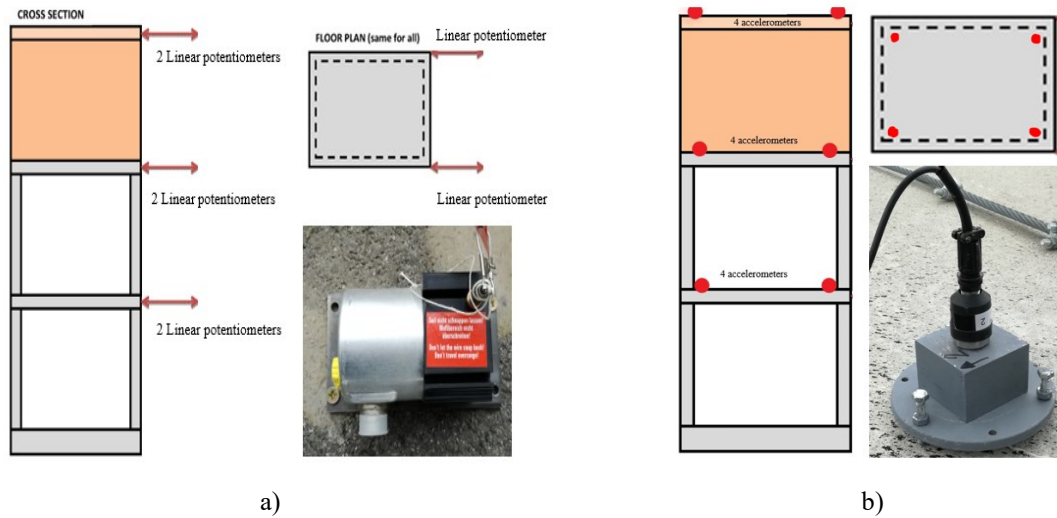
a) Two linear potentiometers on each floor, b) Four accelerometers on each floor
